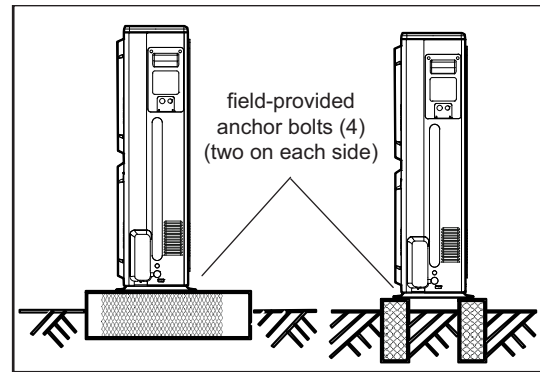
Securing Outdoor Unit to Slab or Frame
